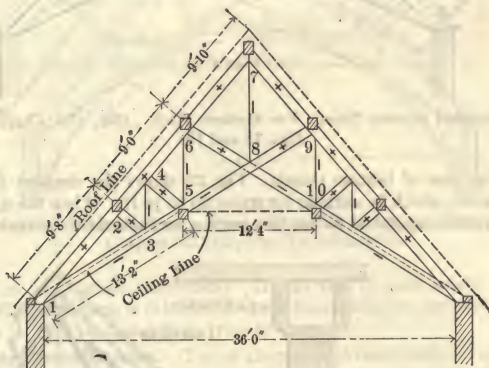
Scissors Truss. Spans Exceeding Thirty Feet
